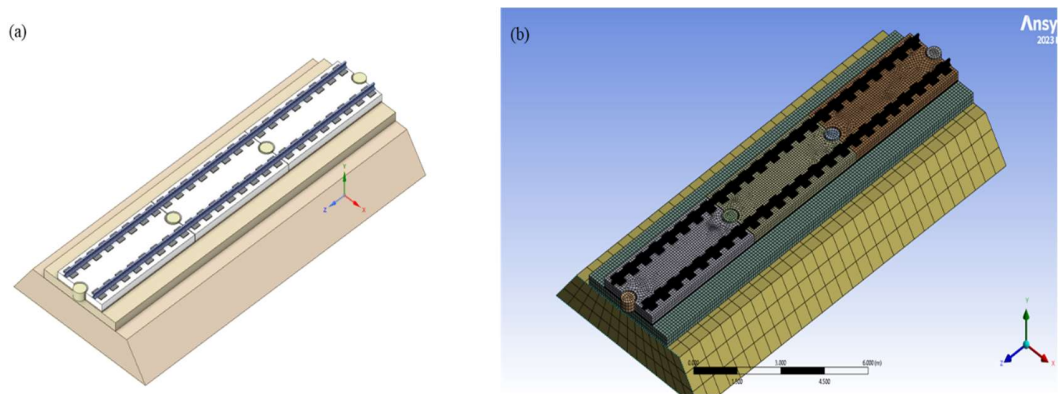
Isometric view of railway track structure and meshing model: a) FEM Slab track model; b) Meshing slab track model
